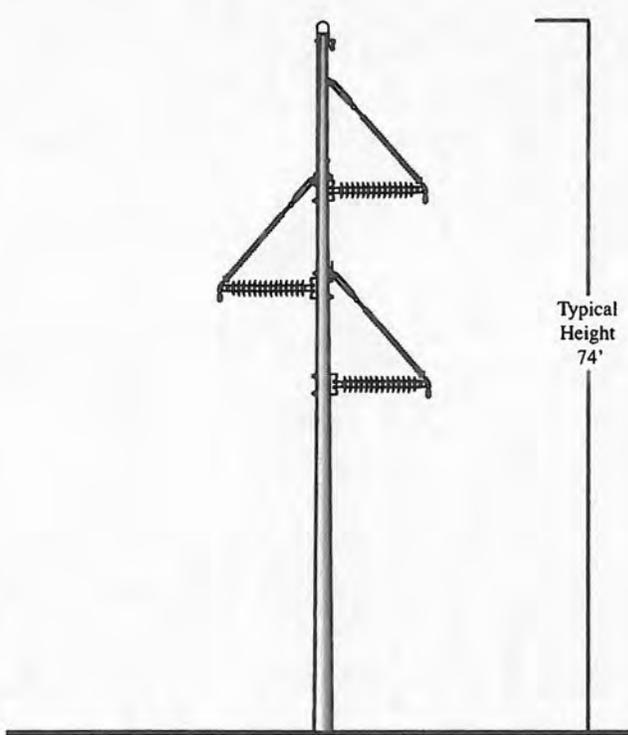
Typical 115kV Single-Circuit Tubular Steel Monopole Structure
